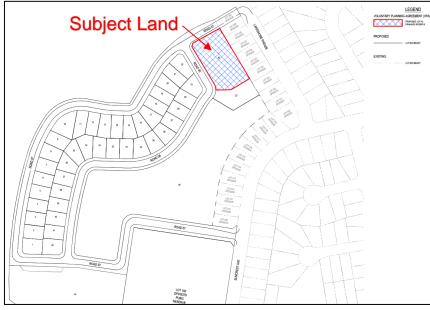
Approved Layout Plan SF10916 – land to be dedicated outlined in red (adapted from plan by MAKER Engineers)
